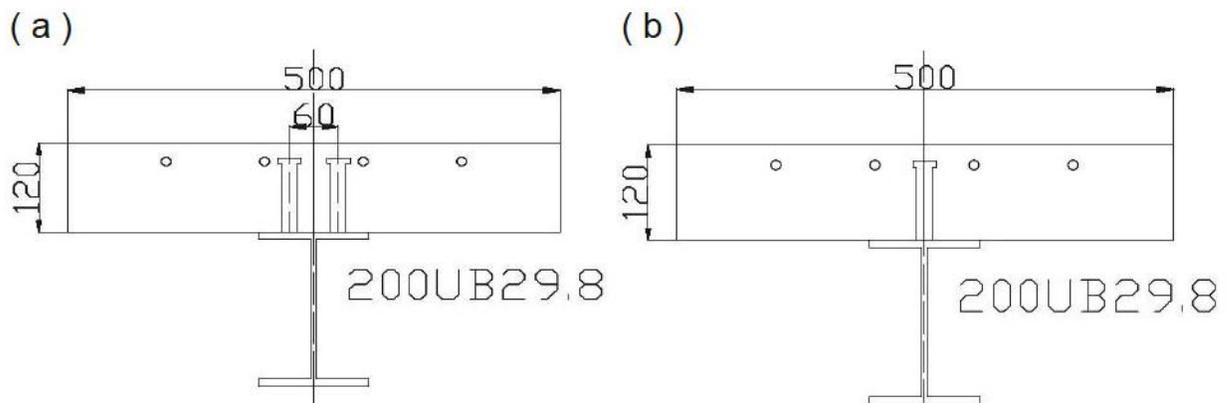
Cross section view of test specimen (a) Full shear connection (b) partial shear connection
